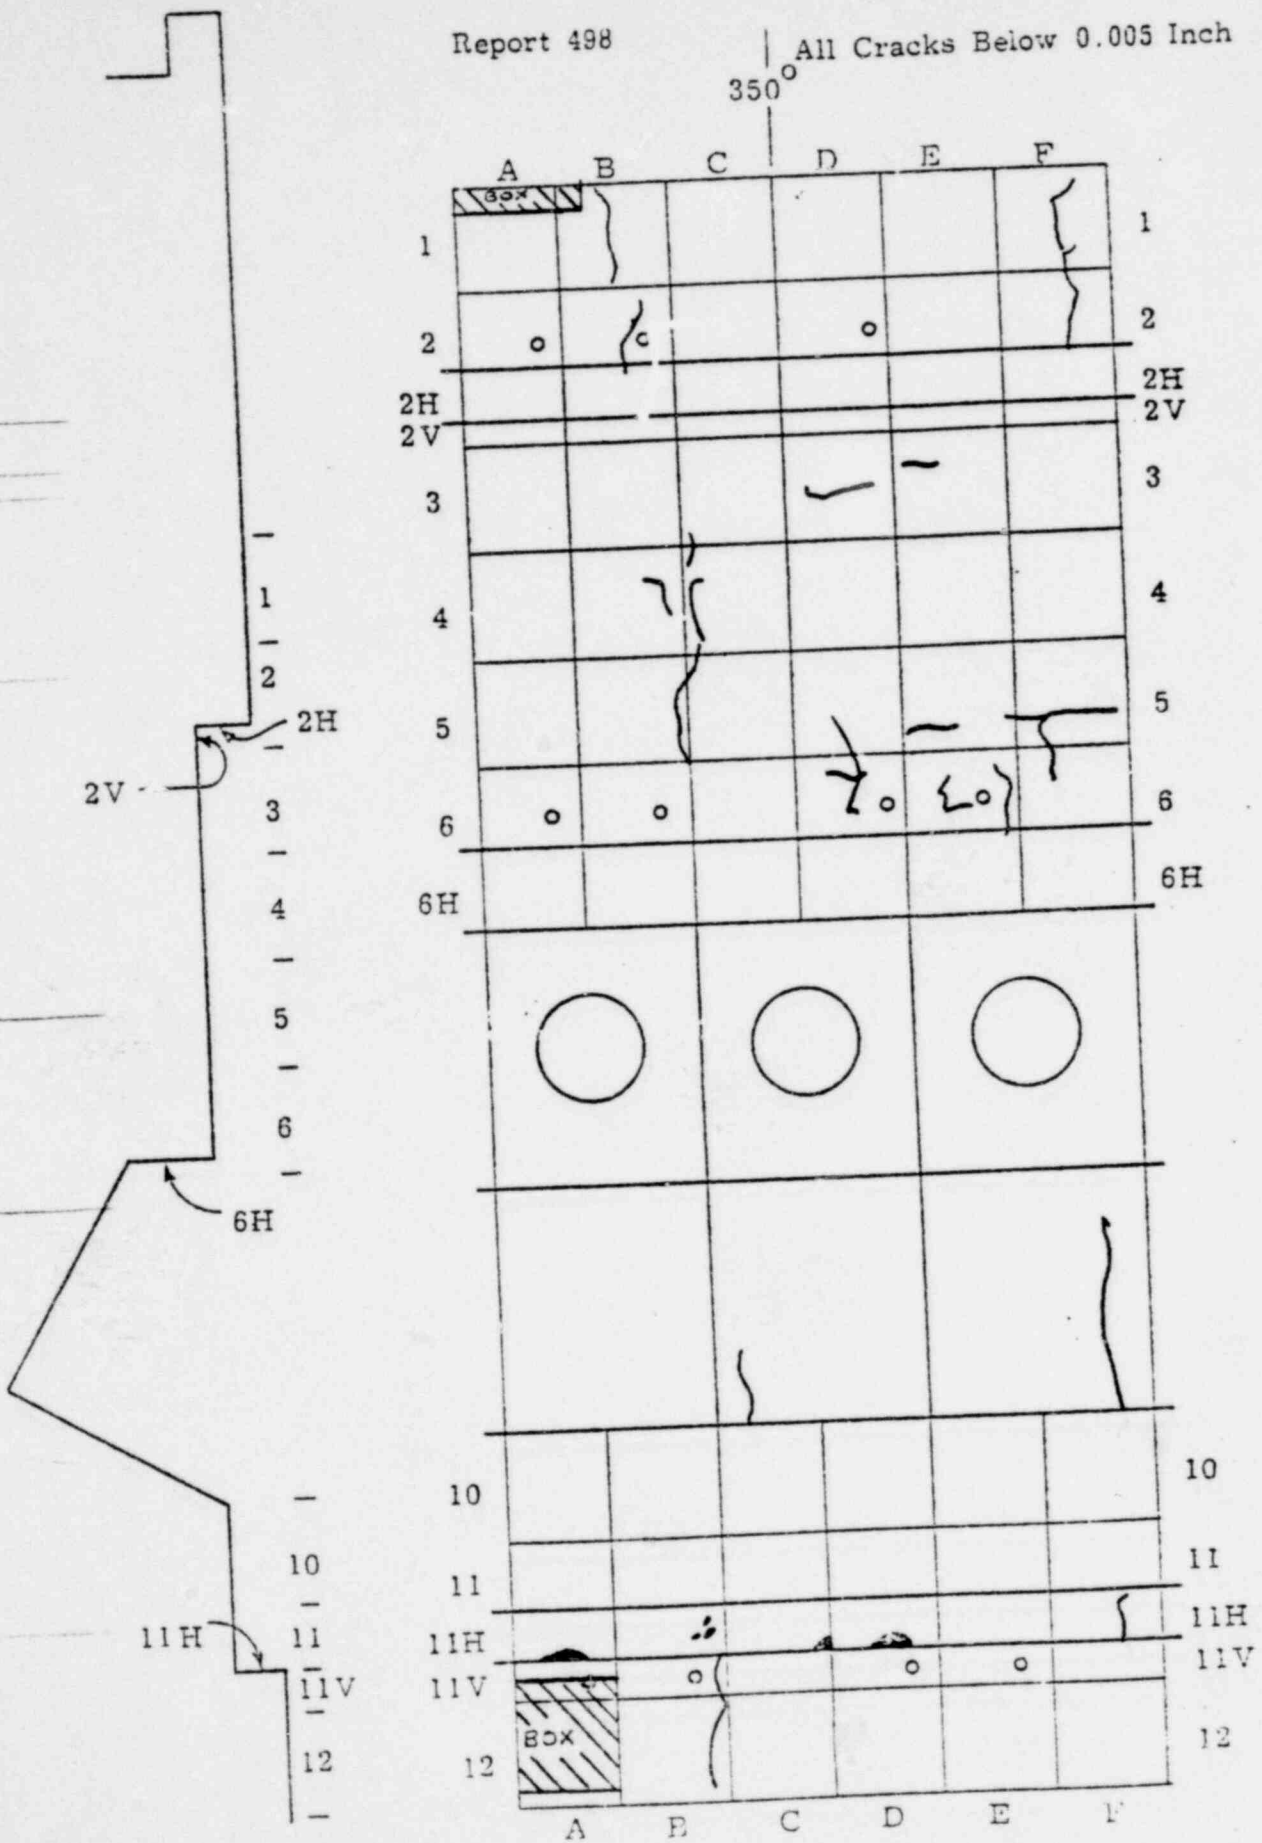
CRACK PATTERN AT AZIMUTH 350° FULL VERTICAL AND DOME PRESTRESS, JULY 5, 1973.
